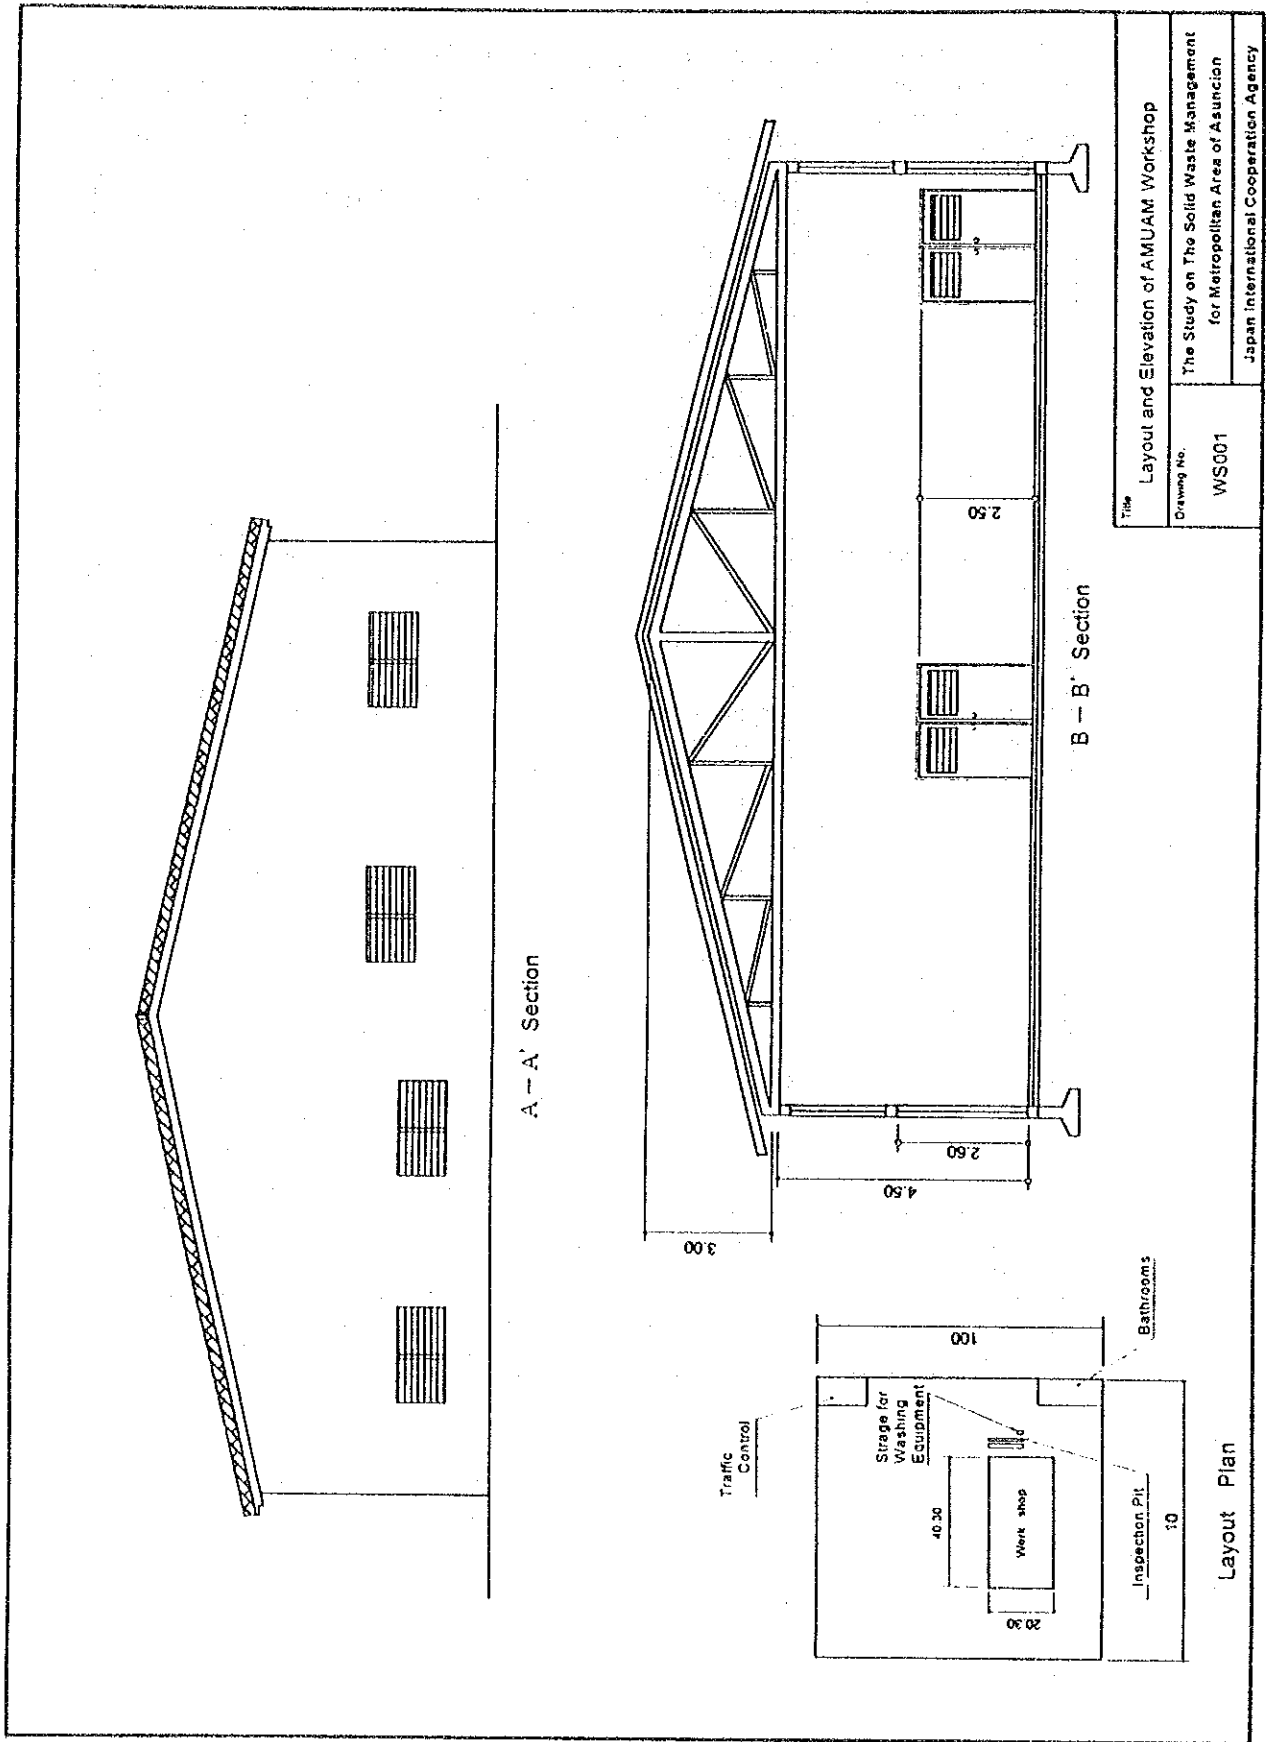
Layout and Elevation of AMUAM Workshop
